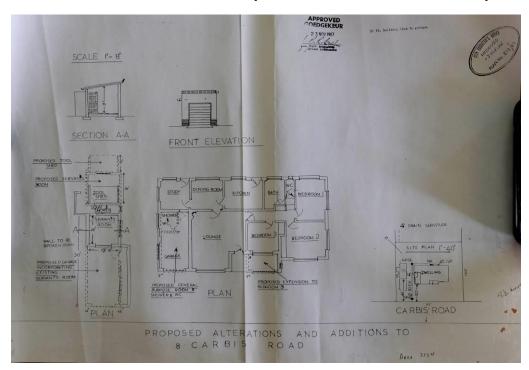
\_Proposed alterations and additions to 8 Carbis Road, 23<sup>rd</sup> November 1967 (Source: Original plan from Mr Henwood, former owner of the property)
